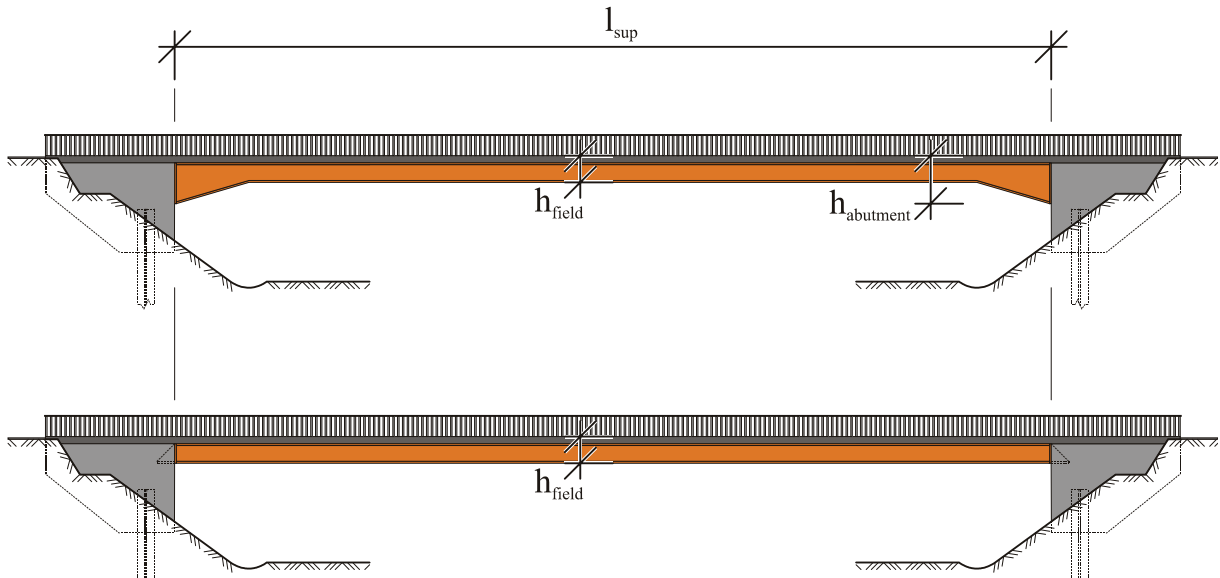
Integral abutment bridge, definition of slenderness (with / without haunch)
